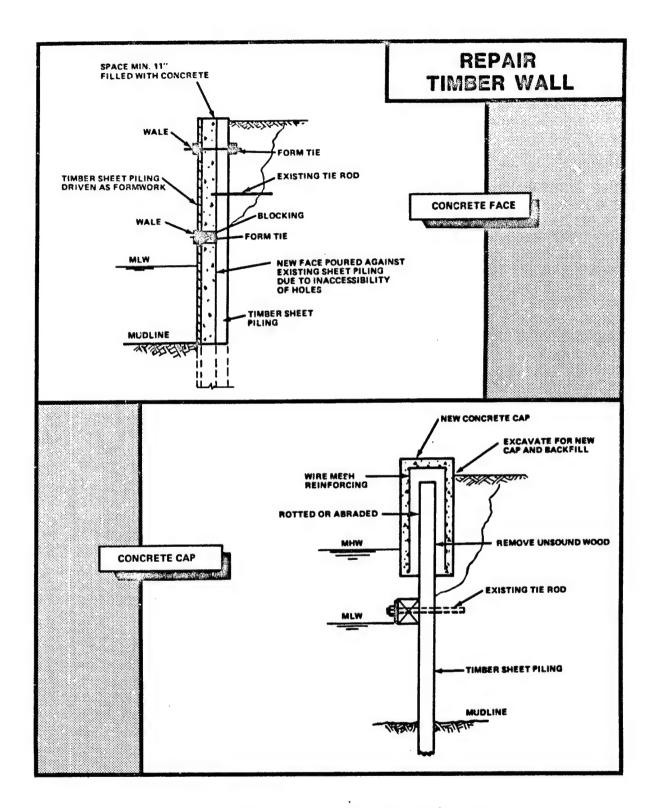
Installing a Concrete Cap and/or Face on a Timber Sheet Piling Wall.
